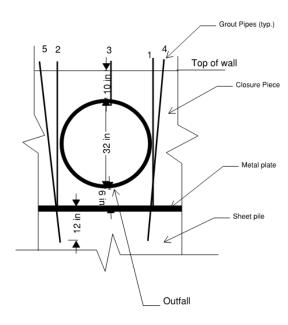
Profile View of Grouting Location at Outfall OF-005-W (Looking Landside)
